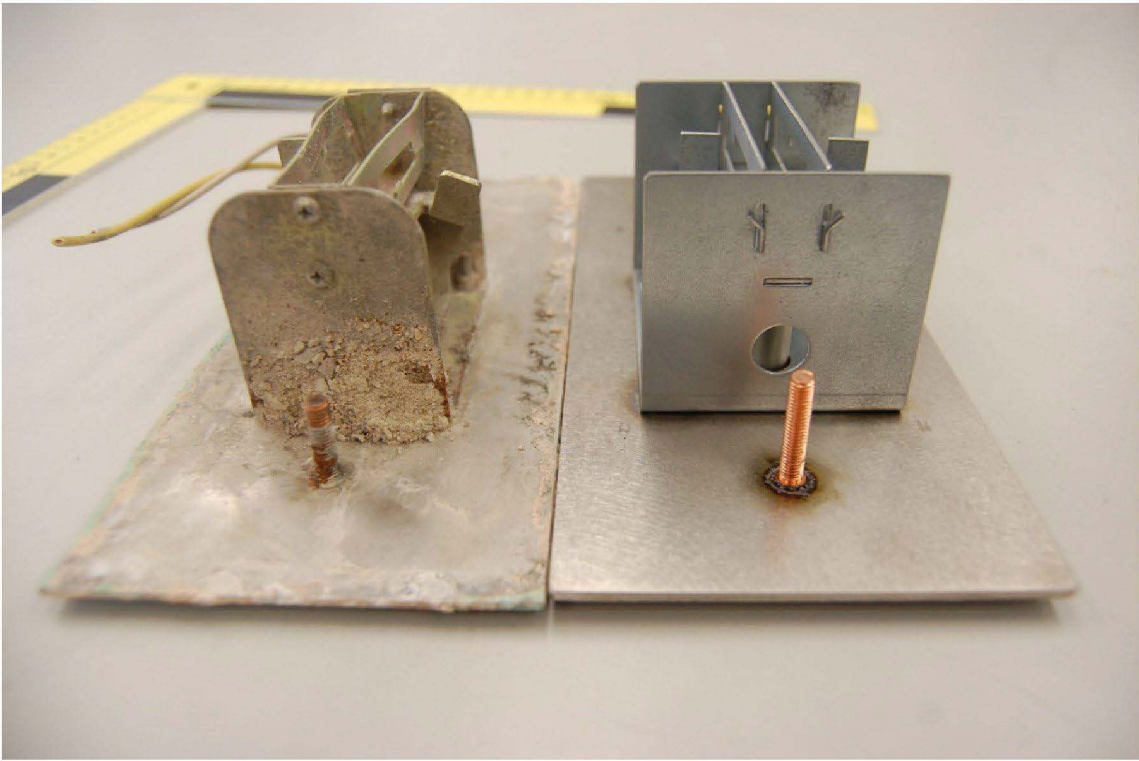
Builders’ material on top of fire control switch BJJ/74 (left) and new fire control switch ER/2 (right)
